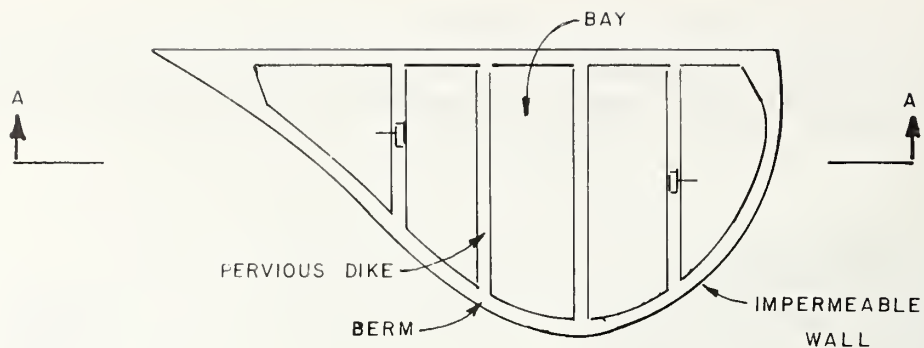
DETAILED LANDFILL PLAN FOR SOUTH SECTOR [10-1]
